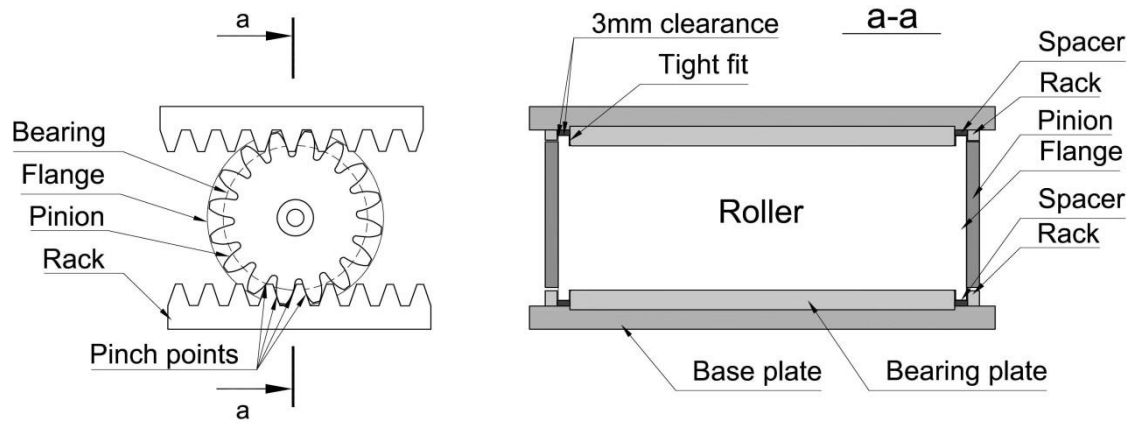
Bearing layout: side (left) and cross section (right) views.
